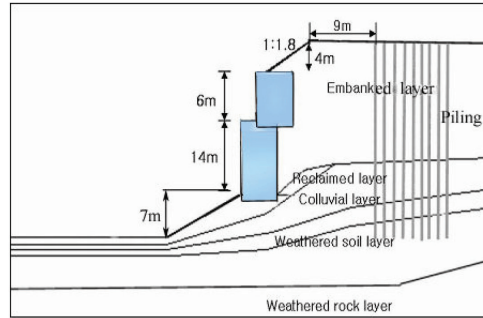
shows the situation at the time of the collapse. Total 34 piles were planned to install to support the abutment. The global slope failure occurred at No. 5 pile driving which was twentieth pile driving.
